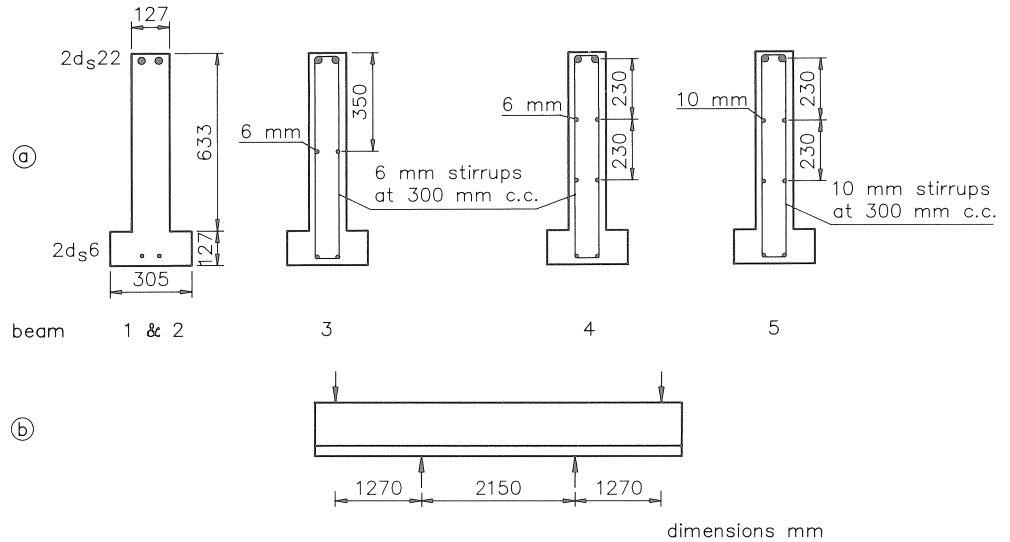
Cross-section (a) and loading scheme (b) [Beeby, 1971].
